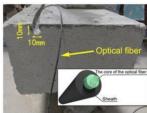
Planting of fiber optic cables on concrete (Hou et al., 2021)
